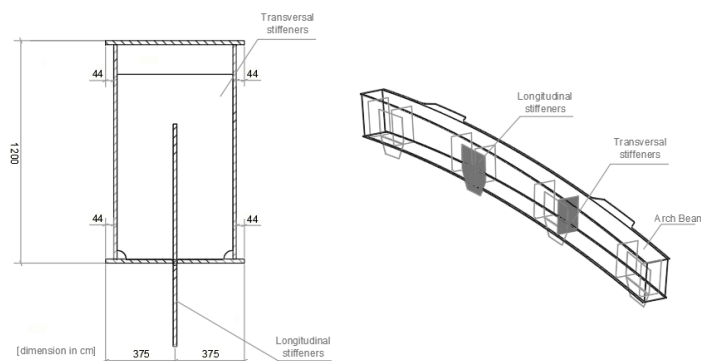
Beam profile for the arch element and 3D view of the beam.
